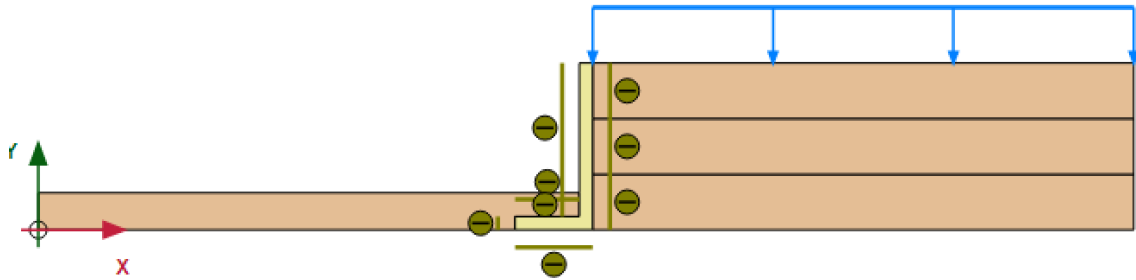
Retaining wall with no backfill slope and no TDA backfill
